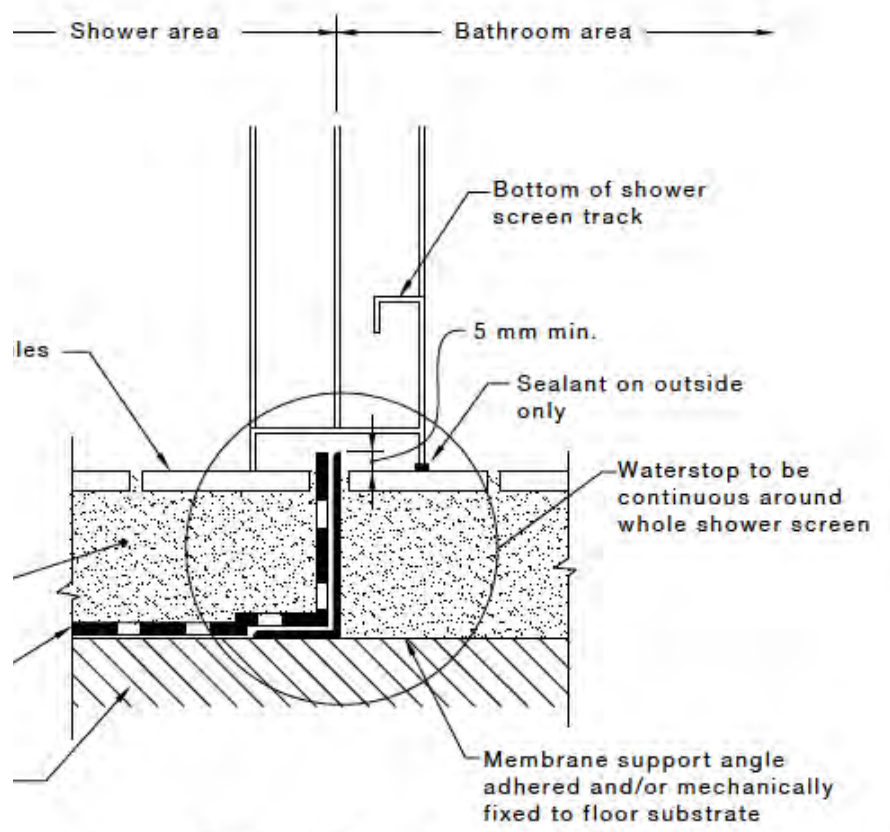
TYPICAL HOBLESS CONSTRUCTION
